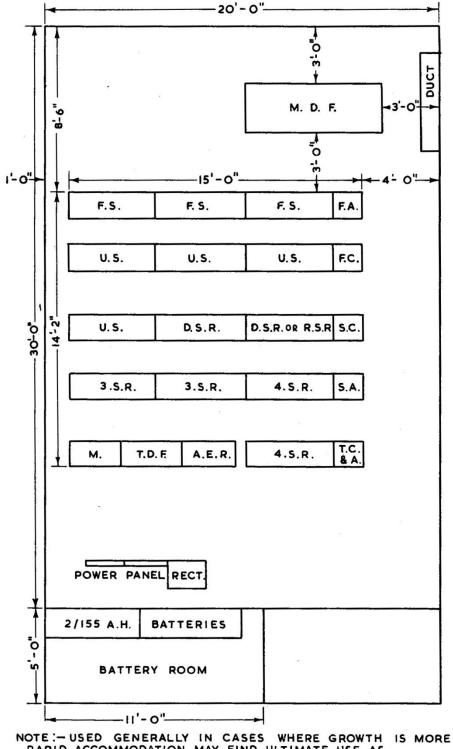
EQUIPMENT LAYOUT FOR STANDARD BUILDING. TEMPORARY ACCOMMODATION. FOR 200/400 BRANCH EXCHANGE.
